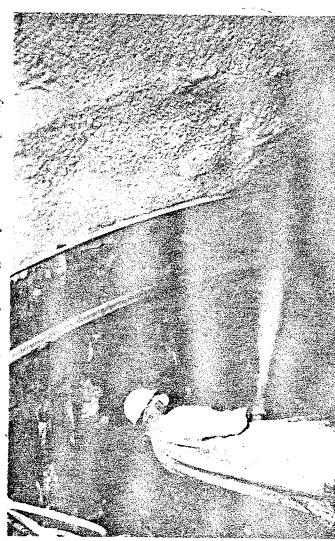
Full-face driving of the roof section in the parallel tube of the Serra Ripoli tunnel, using shotcrete reinforced by sectional steel. Same geological conditions as in Fig. 17
